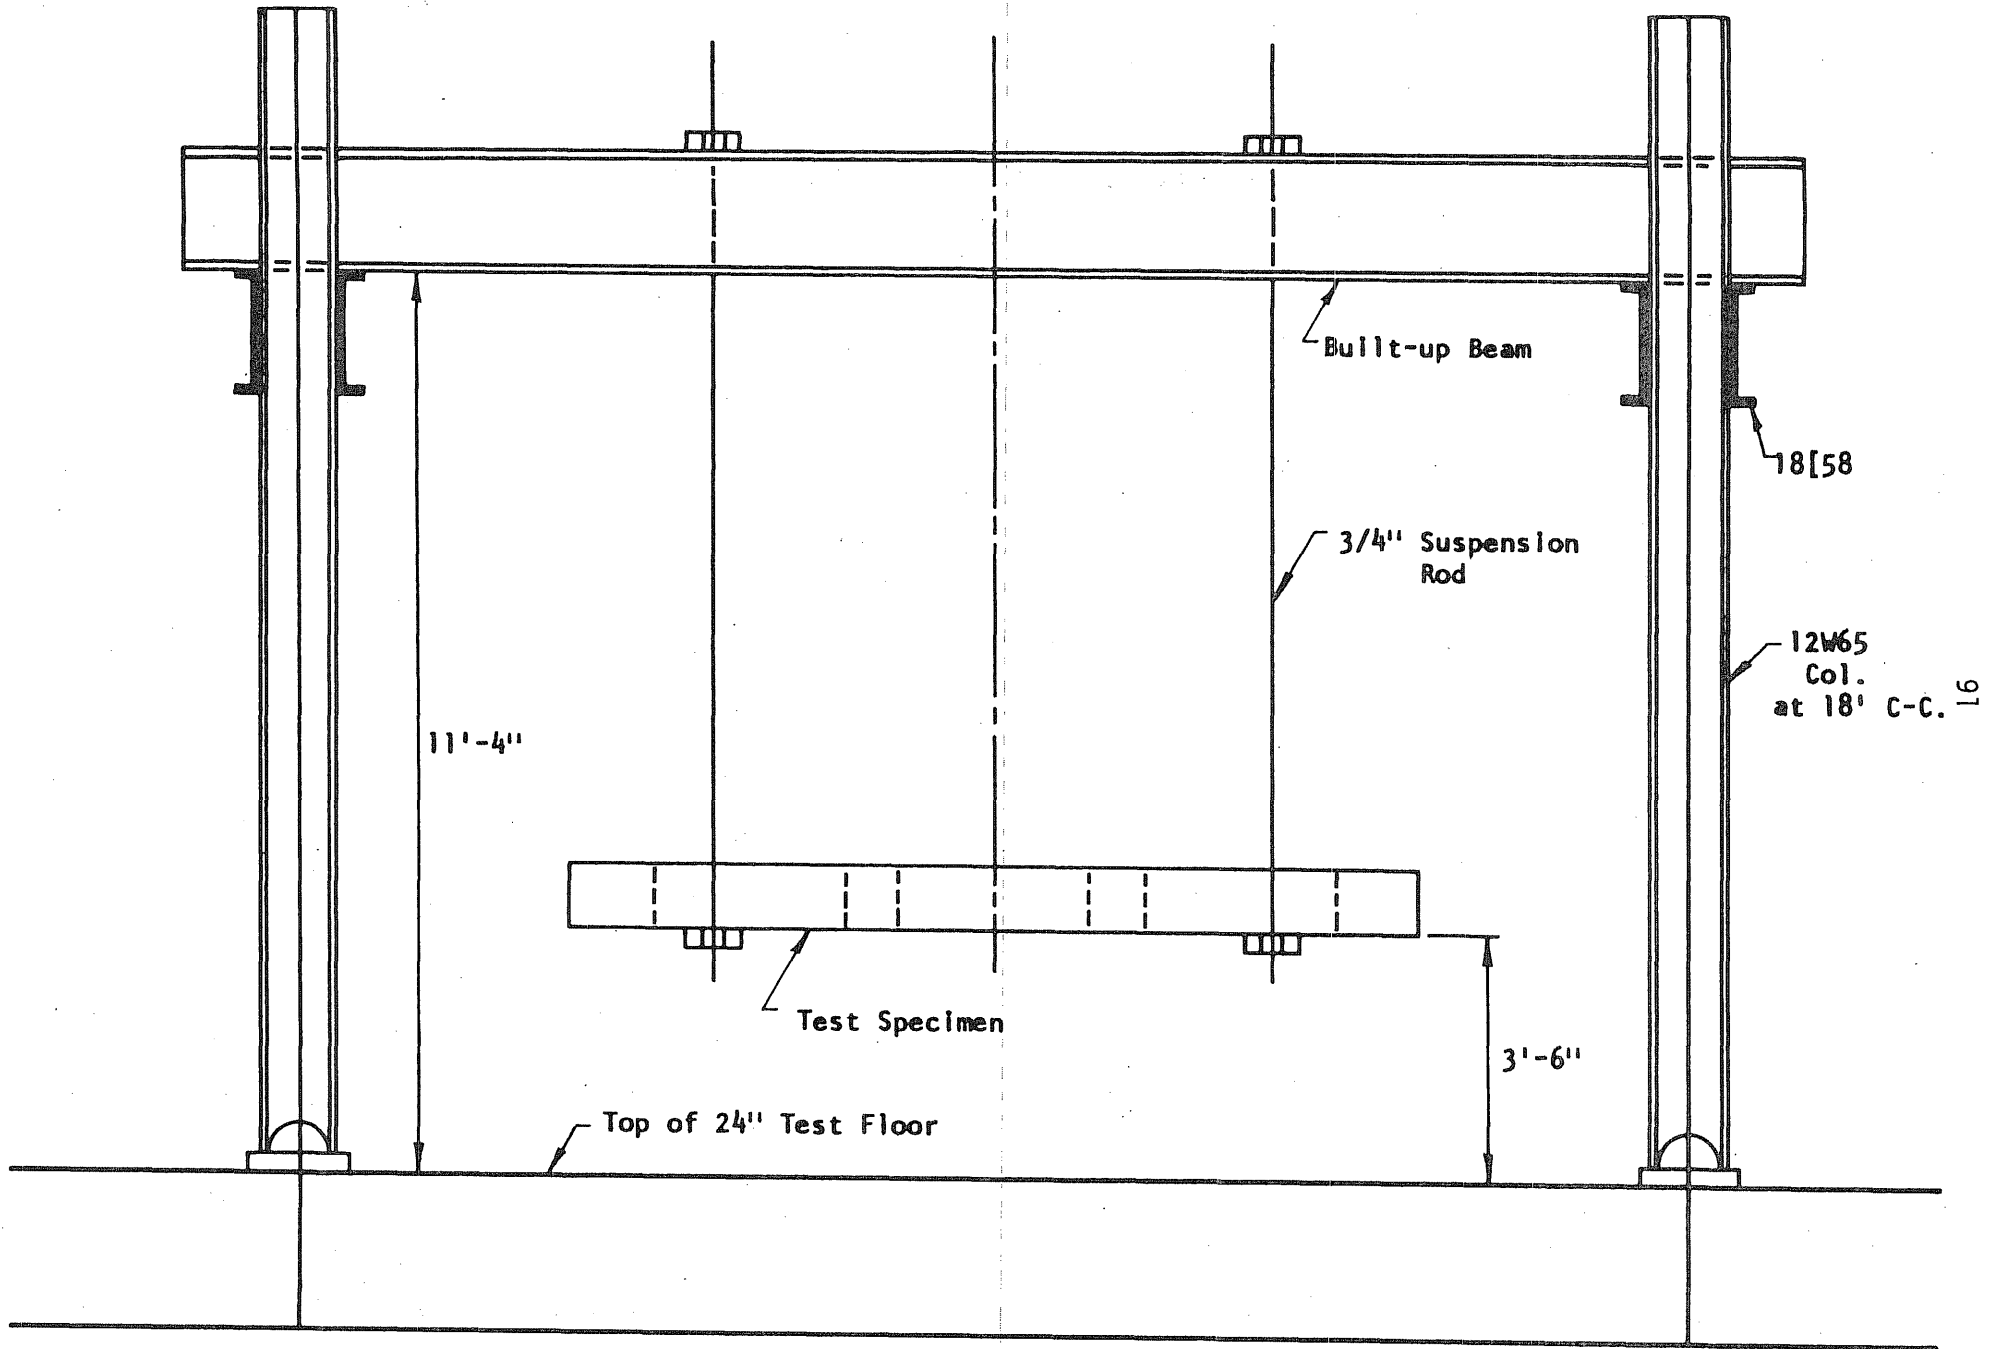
SIDE ELEVATION OF TEST FRAME WITH SPECIMEN IN PLACE
